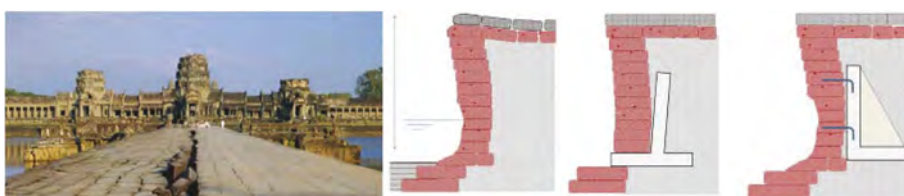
(a) Retaining wall structure of the west causeway of AngkorWat (south side). (b) Original structure, (c) RC-retaining wall (EFEO) and (d) RC-retaining wall (Sophia Univ.).
